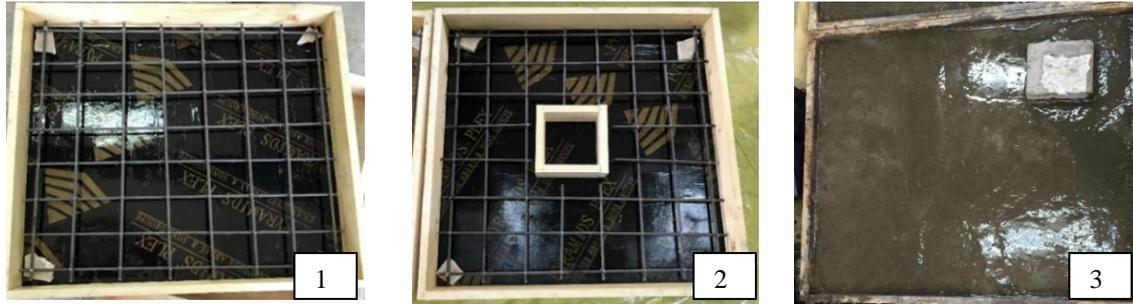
Specimen preparation and casting: (1) Wooden mould and reinforcement of slab (SC), (2) wooden mould and reinforcement of slabs (S1, S1.1, S1.2), (3) casting of slab (S2).
